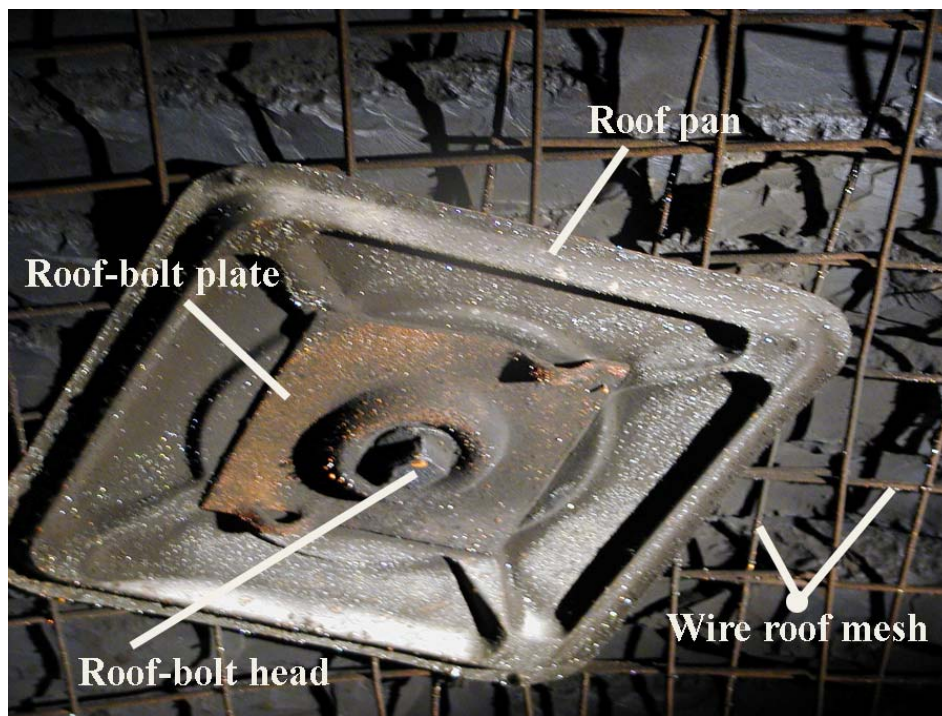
A typical arrangement of roof support, consisting of a roof bolt, roof bolt plate, roof pan, and wire roof mesh—all held against the mine roof by the head of the roof bolt. Square pans (commonly called “spider plates”) and round pans (commonly called “pizza pans”) are not used everywhere in the sealed area. Nor was the wire roof mesh used everywhere. Where it was used, the blast forces of the explosion altered their configuration in a way that helped us to reconstruct details of the blast.
